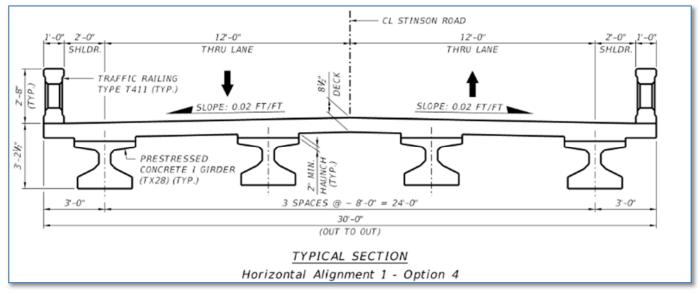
TxDOT Prestressed Concrete I-Girders (TX28) Typical Section
